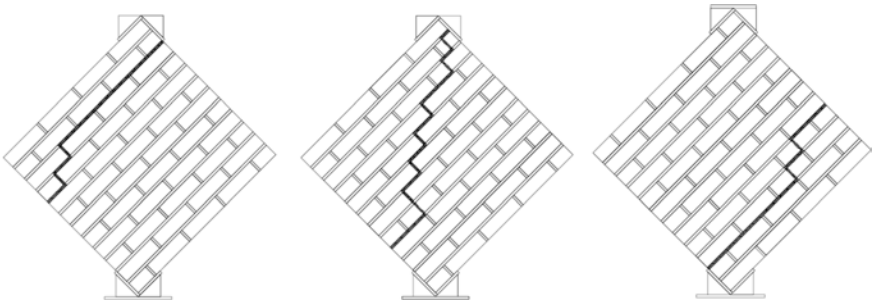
Failure modes of masonry panels. Masonry panel1 (M1). Masonry panel2 (M2). Masonry panel3 (M3)
